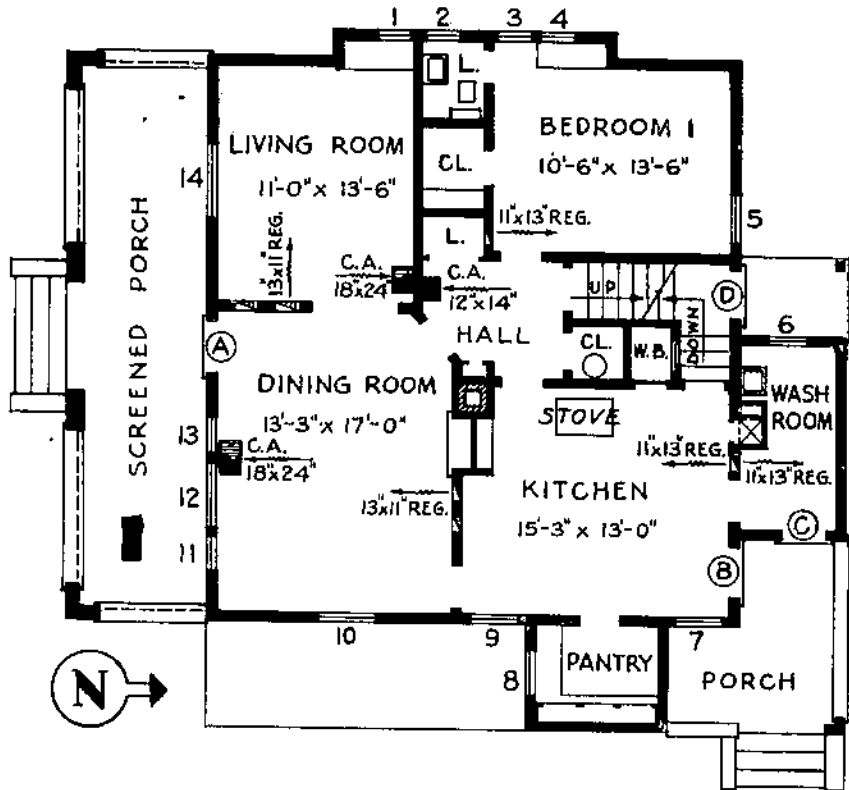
First-floor plan of house No. 1, showing the location of warm-air registers and cold-air returns.
